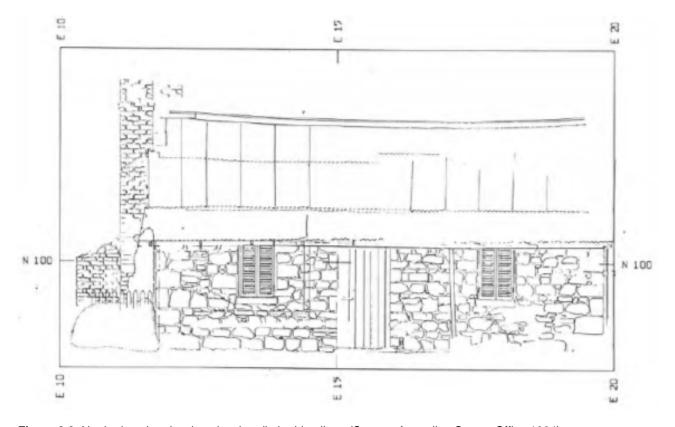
North elevation drawing showing dip in ridge line. (Source: Australian Survey Office 1984)
